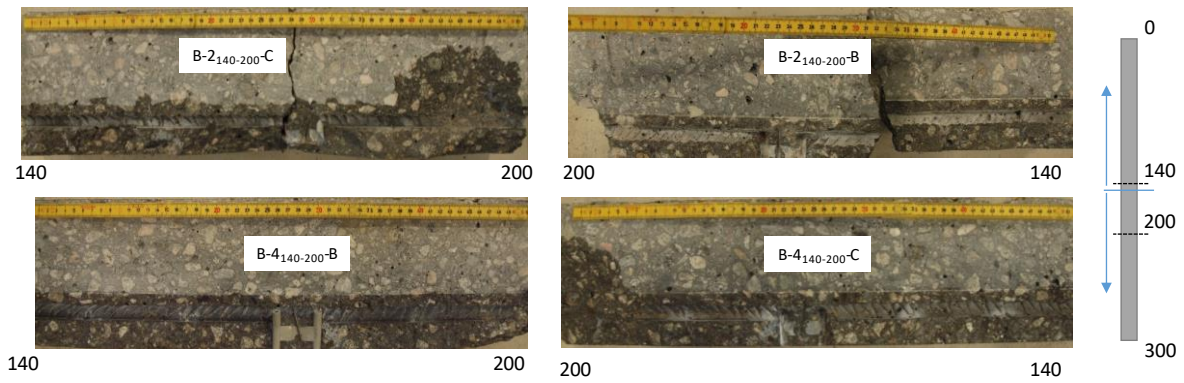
Steel-concrete interface of beam B section 140 to 200 cm. White precipitate at the cracks and spread over the steel-concrete interface. Localized corrosion at the spacer
